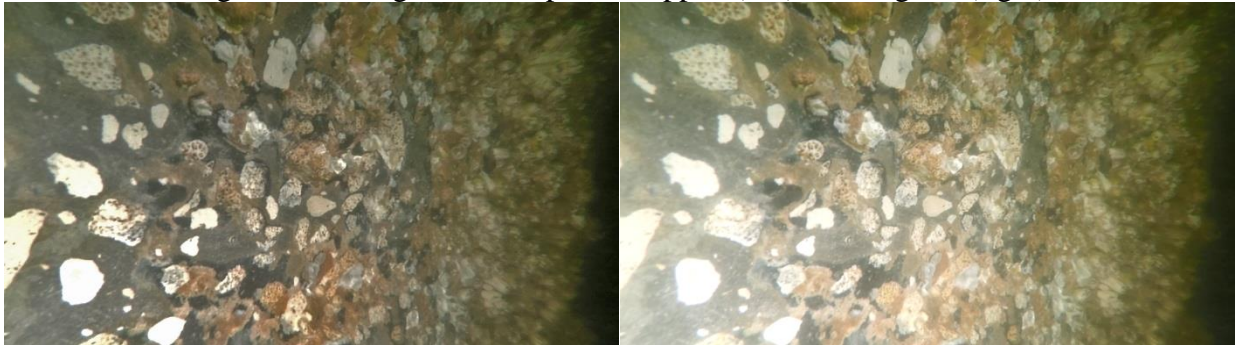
Figure 10.34, photoshopped (left) and original (right)
